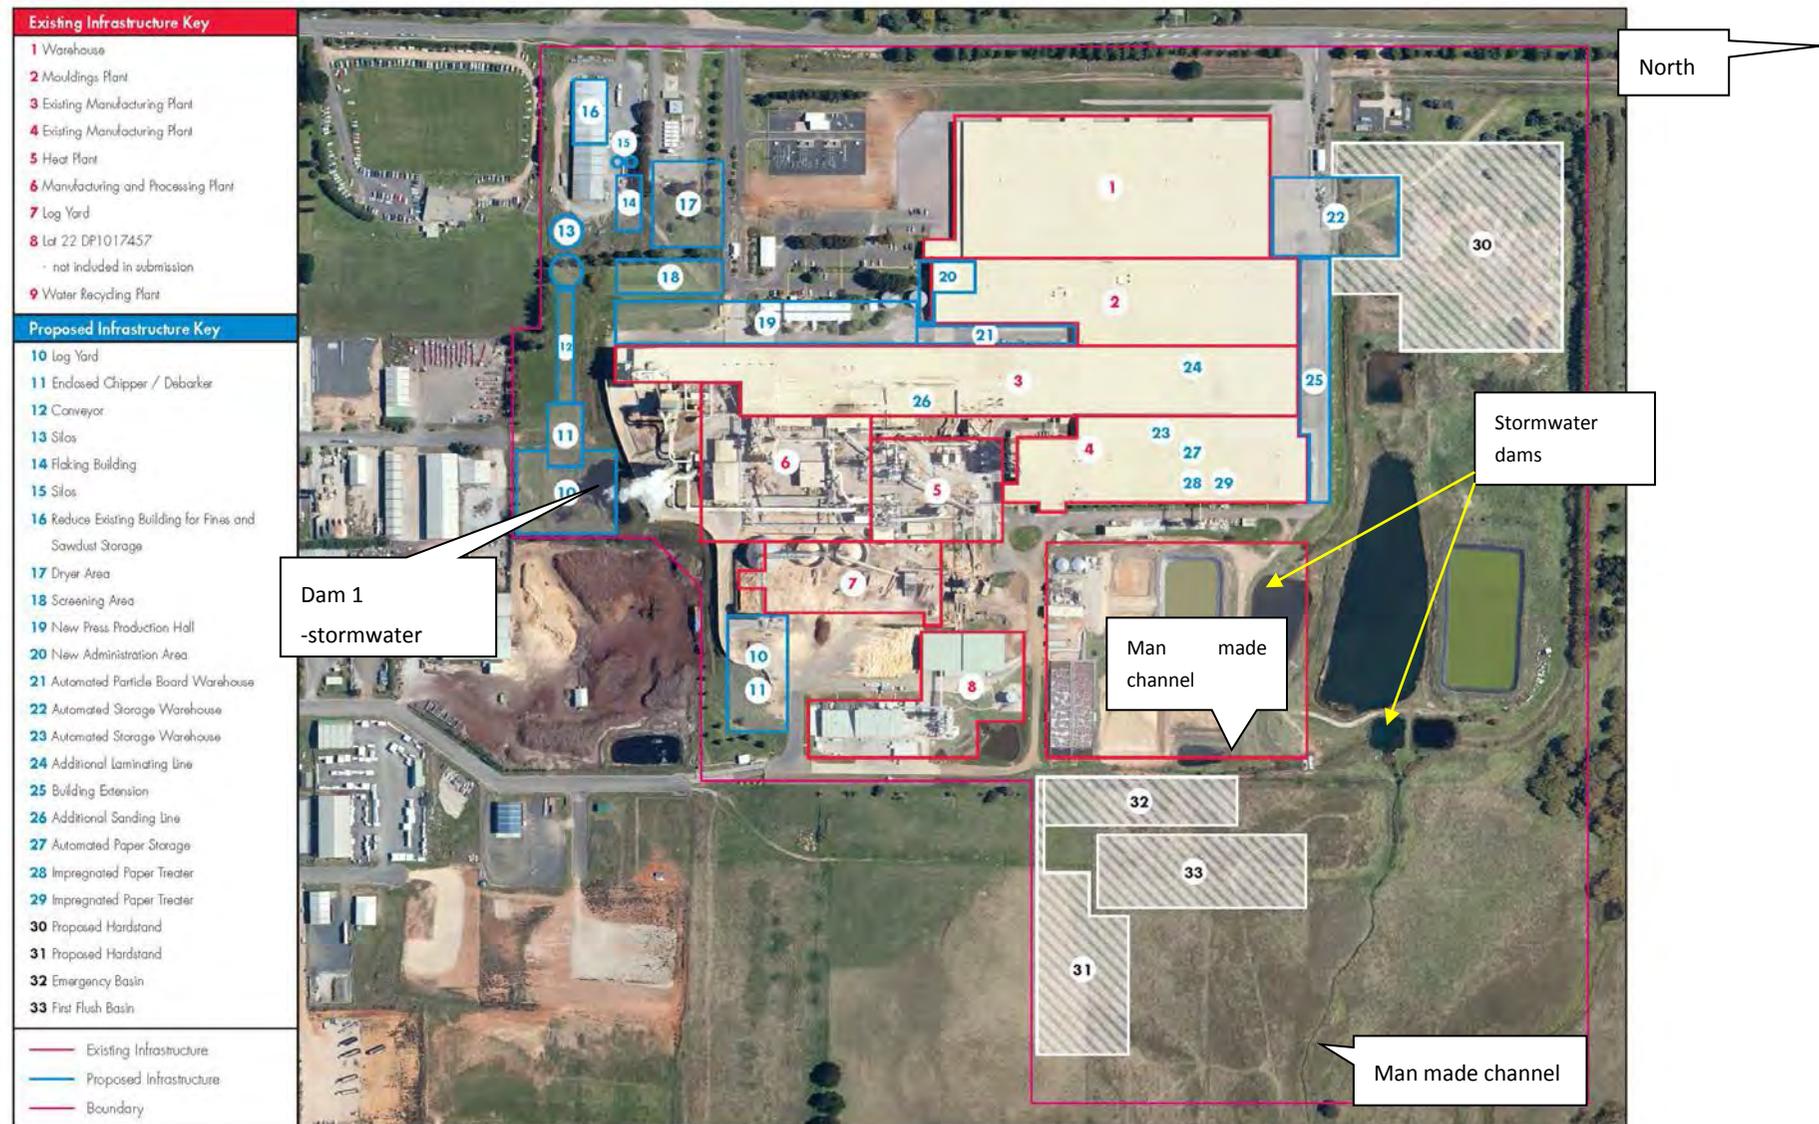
Proposed expansion footprint site plan (from Borg 2016)
